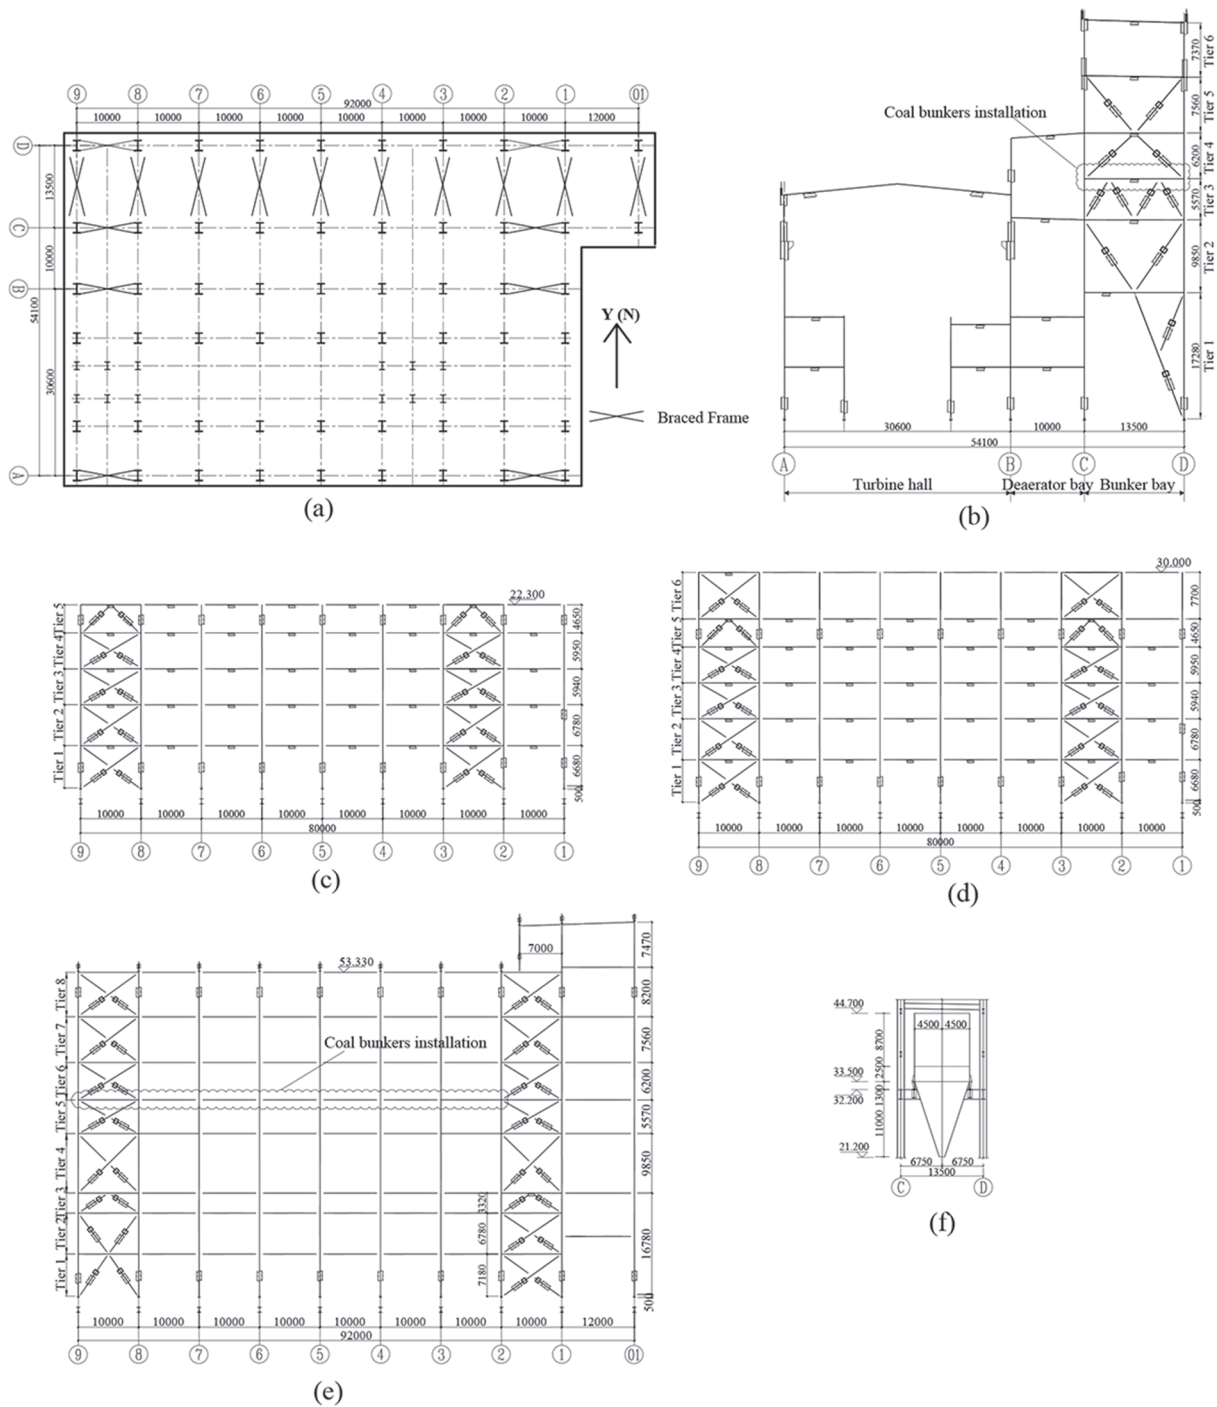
A typical thermal power plant building considered in the study: (a) plan layout at the base, (b) elevation view along Axis 5, (c) elevation view along Axis A, (d) elevation view along Axis B, (e) elevation view along Axes C/D, and (f) elevation view of a single coal bunker
